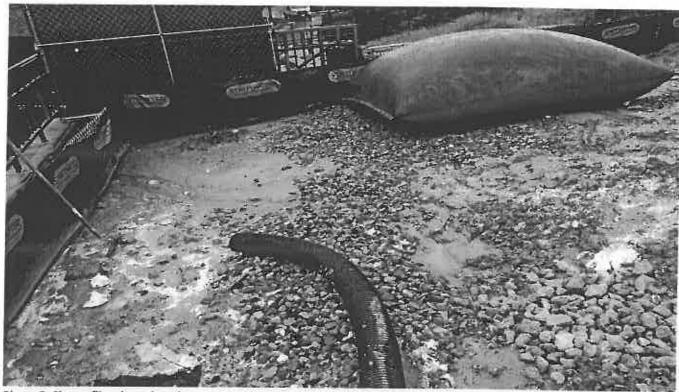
Shows filter bag placed on exposed soil adjacent the tunnel project and the Slope North of the site.
